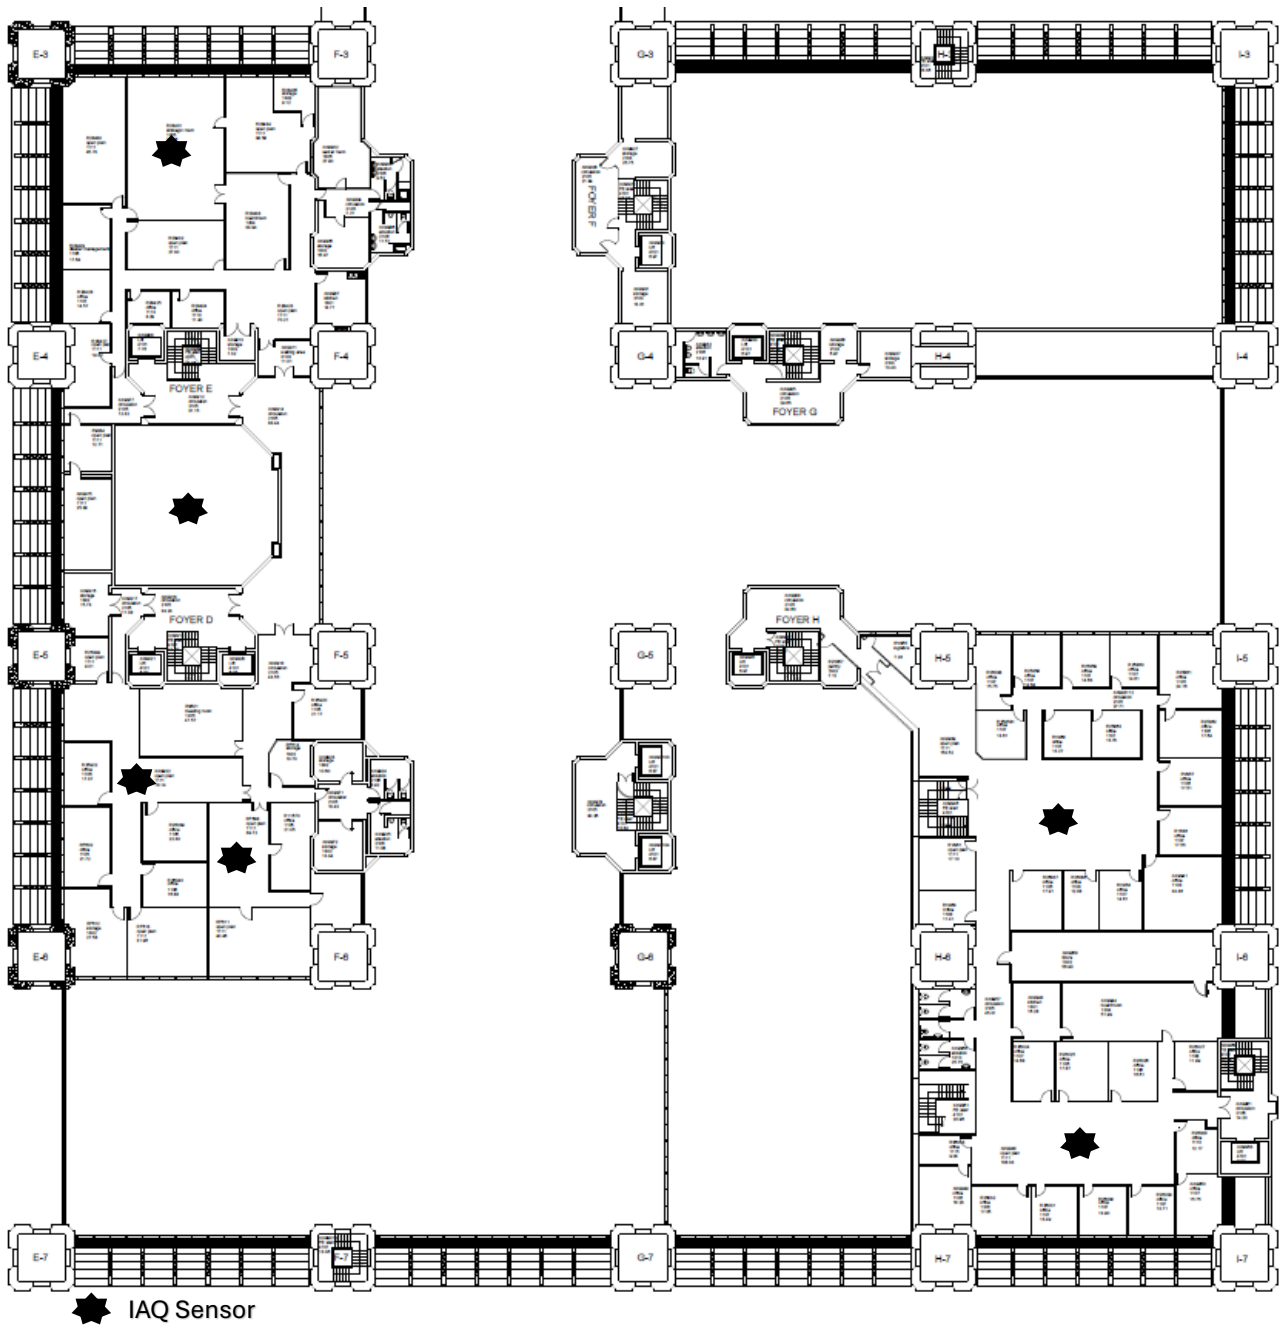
Podium Building proposed sensor positioning 3rd floor (6)
